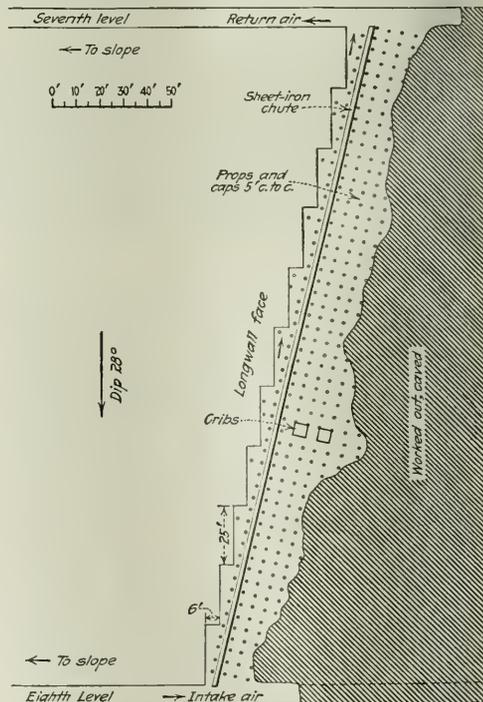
PLAN OF LONGWALL FACE IN OPERATION
